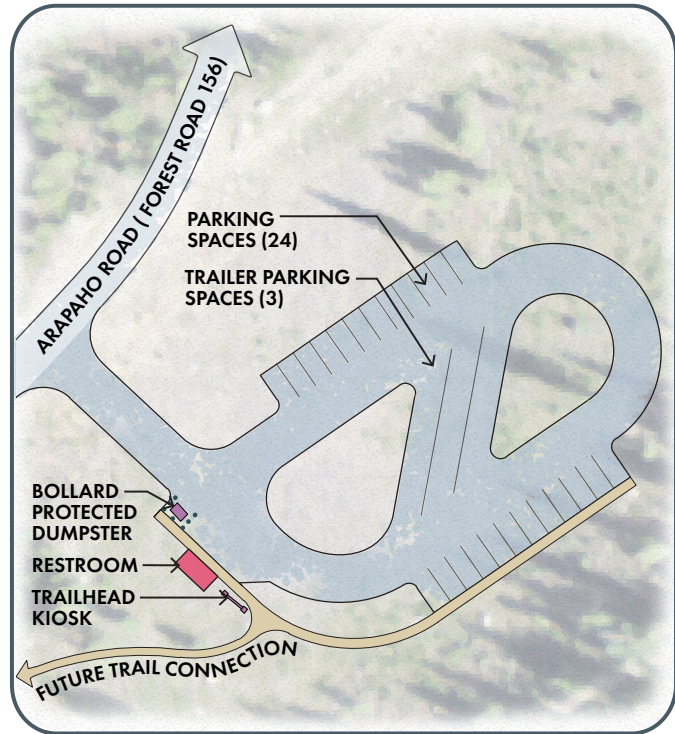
Existing trailhead parking at the end of Arapahoe Road in the Resort/US Forest Service Permit Area.
